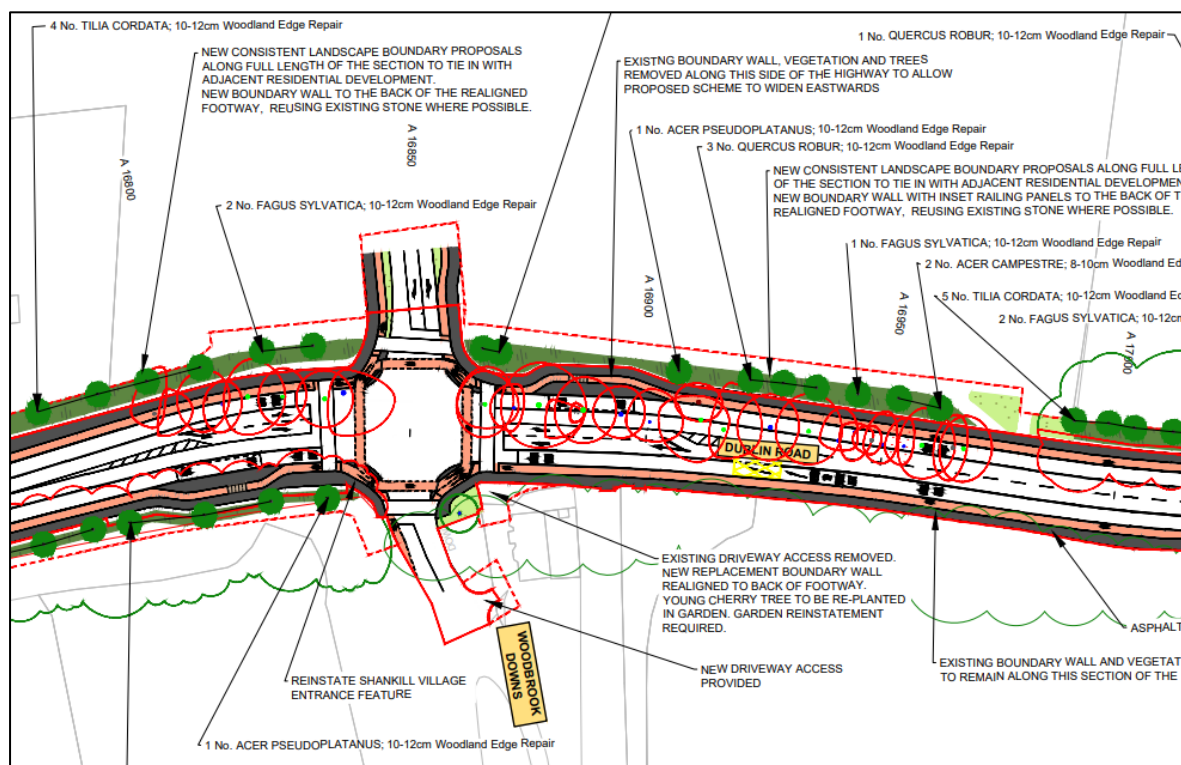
Extract from Landscape General Arrangement Drawings at Woodbrook Downs (Sheet 48)
